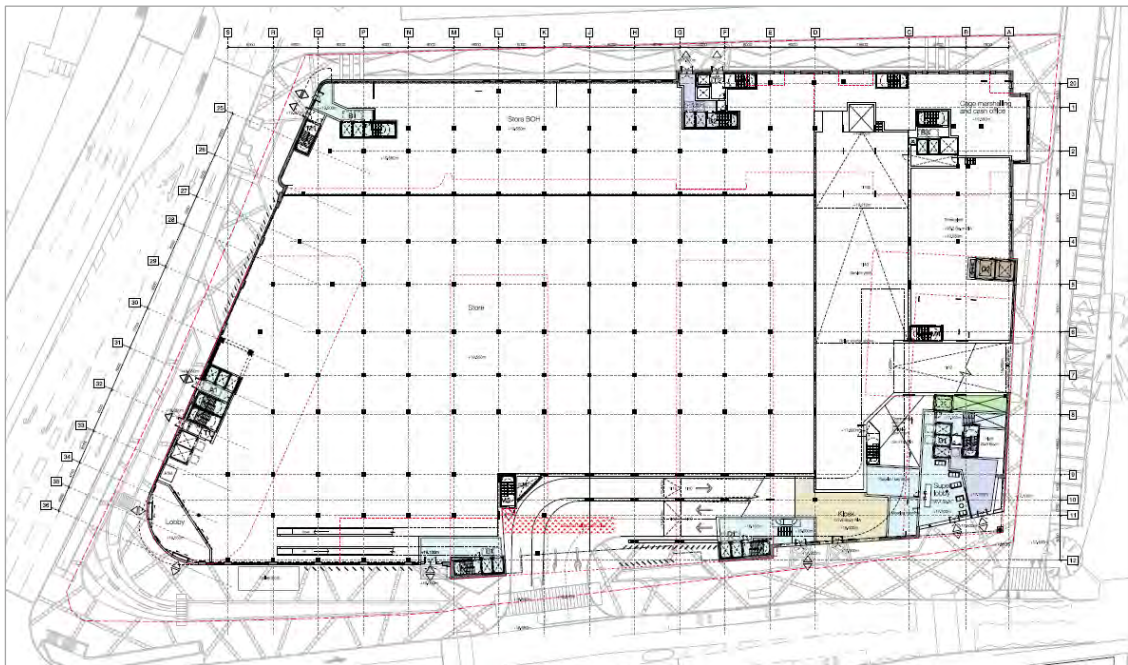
Site layout at ground floor (Patel Taylor, 2020)
